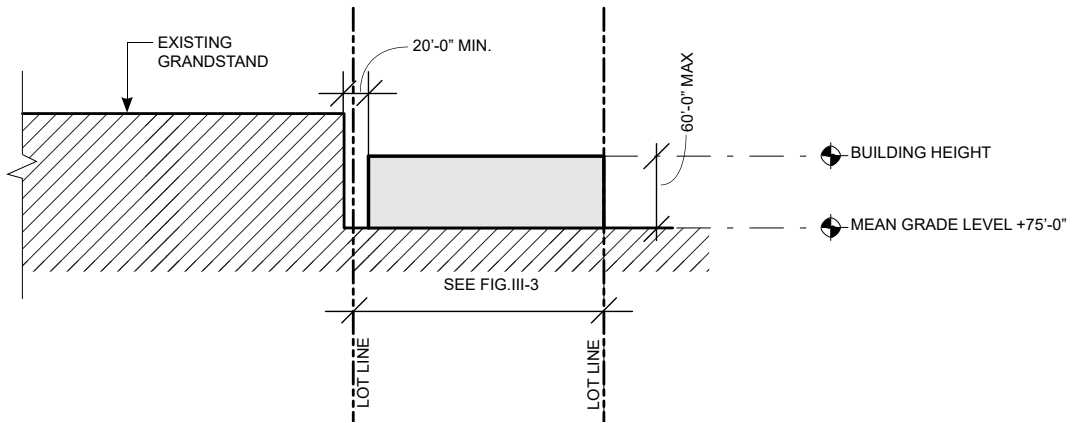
BUILDING HEIGHTS - HOTEL
